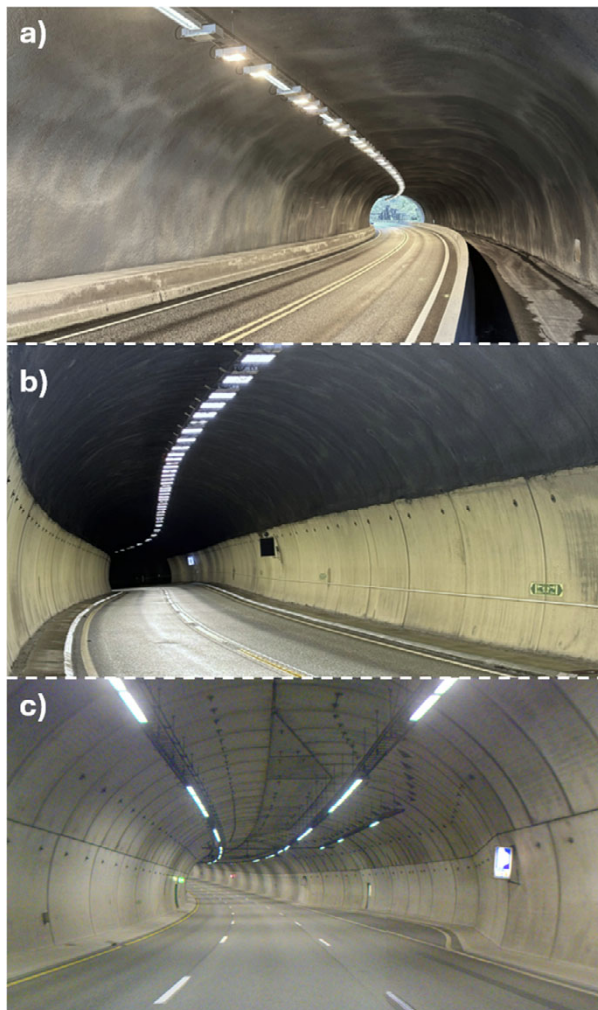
Different types of tunnel linings. a) PE foam covered with shotcrete and a concrete kerb (walkway on the right). b) Concrete elements in the walls; PE foam covered with shotcrete in the crown. c) Concrete elements with membrane for waterproofing and, where applicable, XPS for frost insulation
